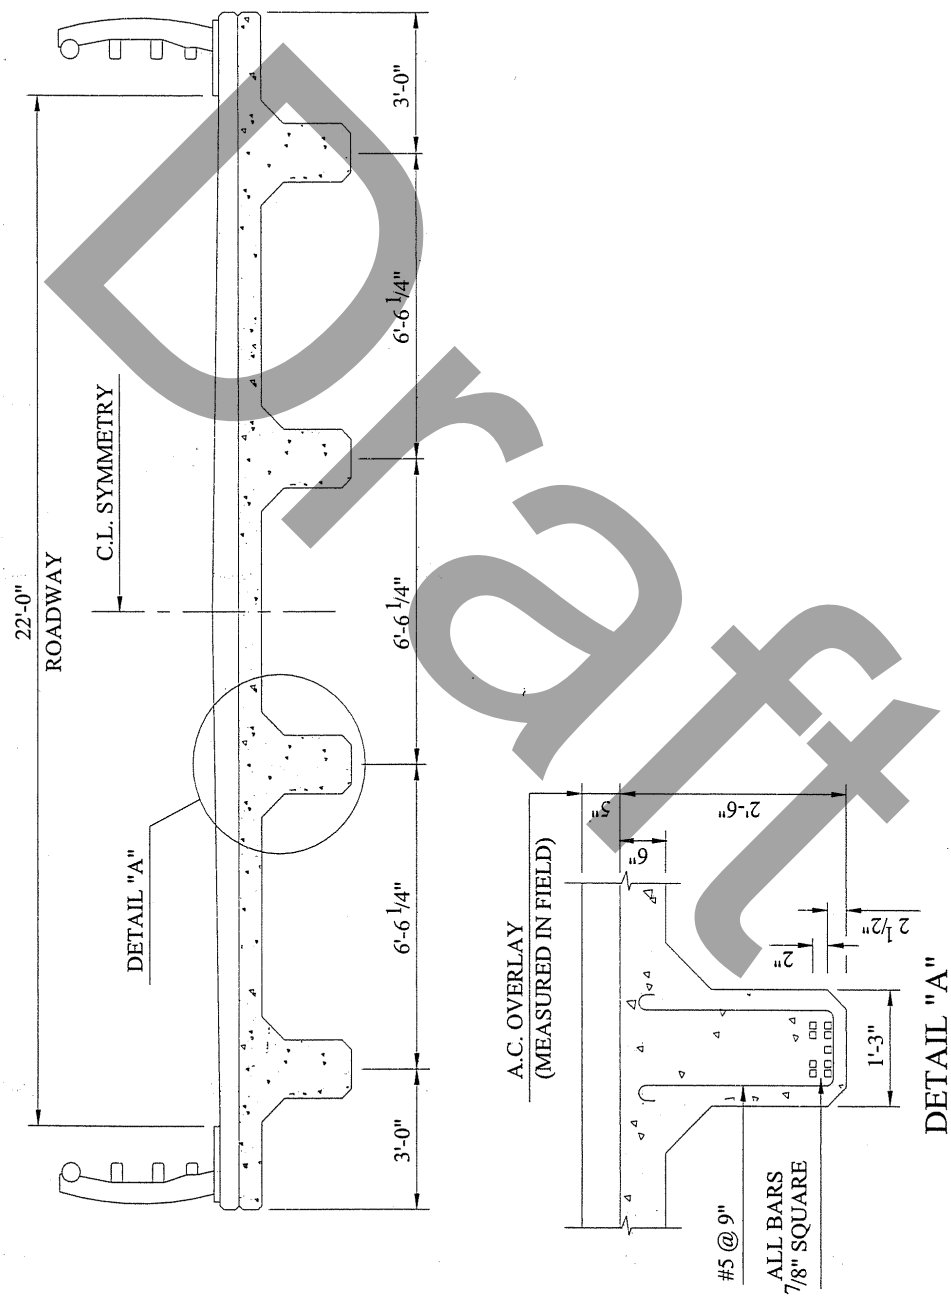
A.2.2-1—Reinforced Concrete T-Beam Bridge
